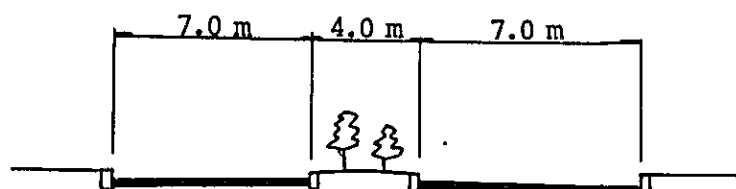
TYPICAL CROSS SECTION OF EXISTING ACCESS ROAD
